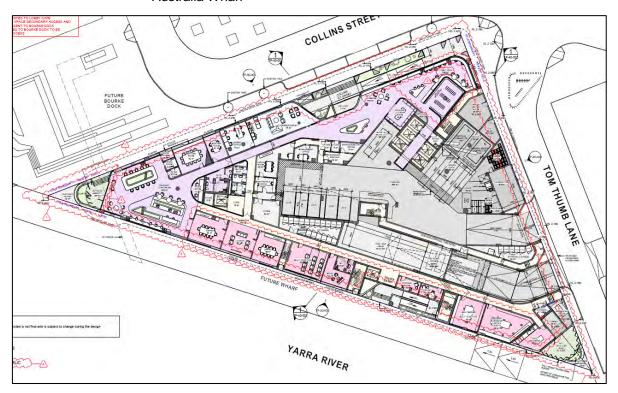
exert of the Ground Floor Plan (TP-21-000) prepared by Cox Architecture dated 14 September 2023 (Rev. 2)
